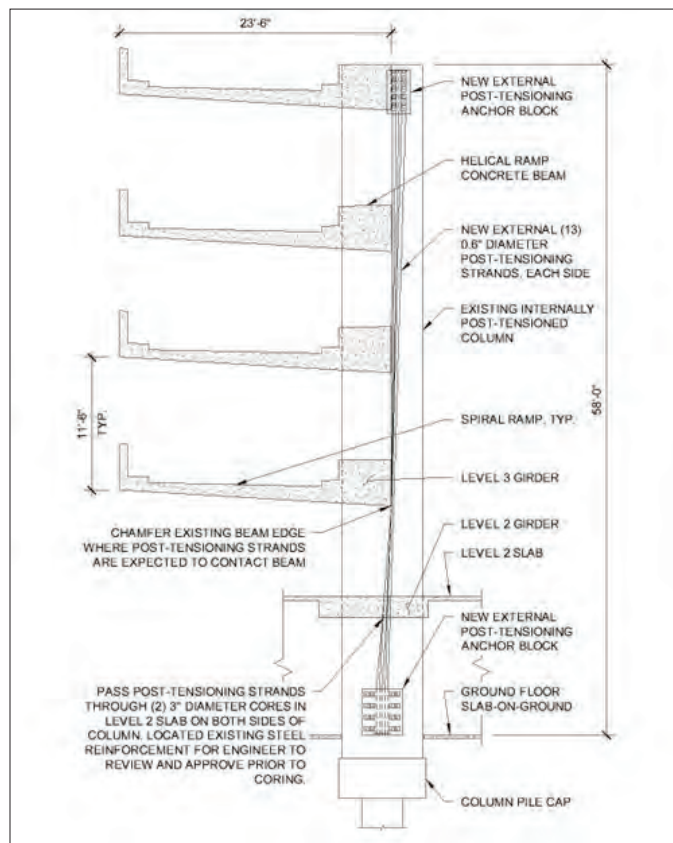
Elevation of the vertical external post-tensioning strengthening of a cantilever column
